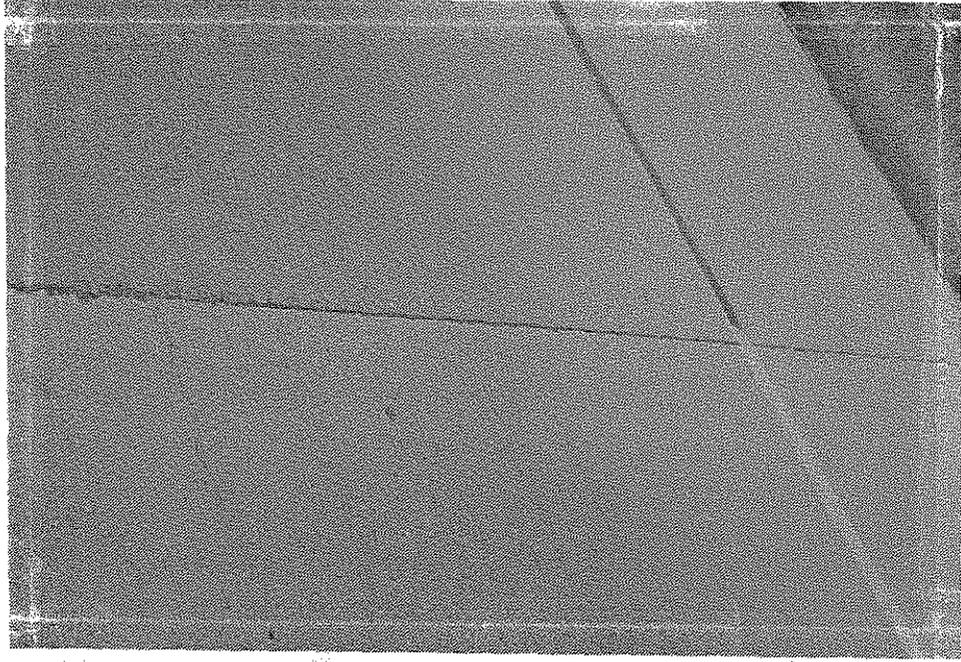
Photo of Spalls Caused by Differential Vertical Movement.
